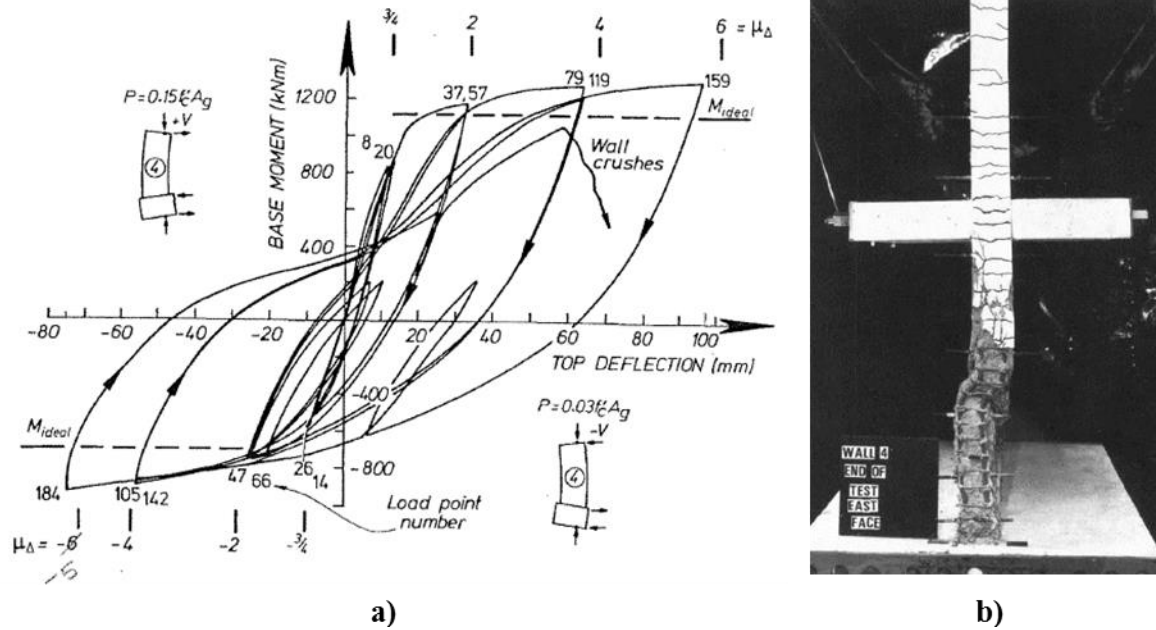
Wall 4 – a) Base moment vs. drift at top of wall, and b) Damage at east boundary
